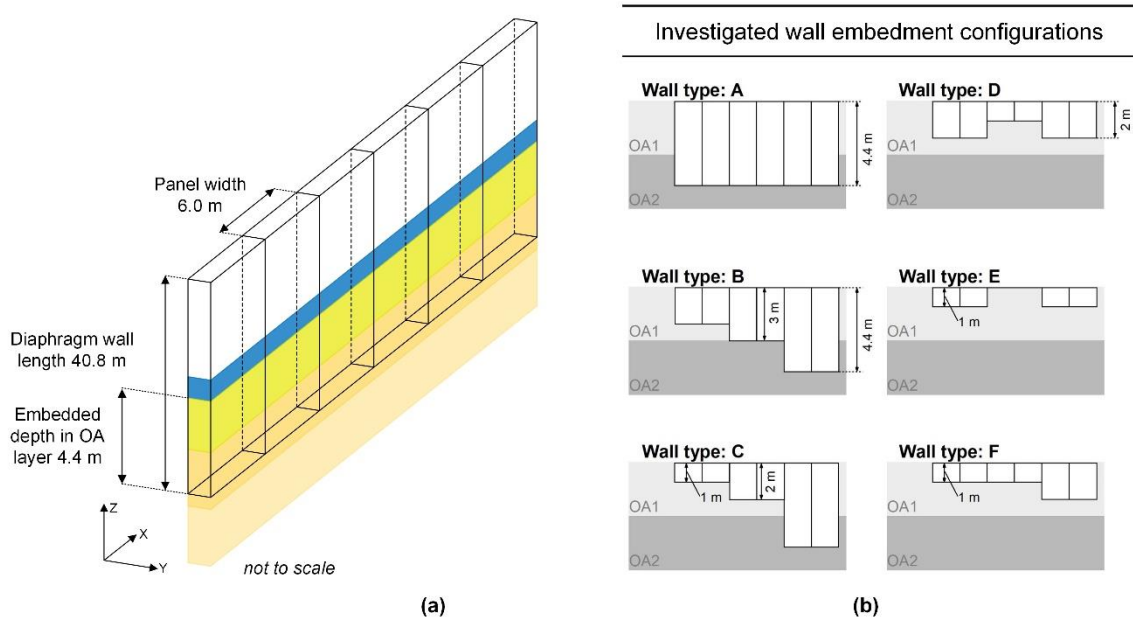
(a) Schematic view of wall geometry and (b) wall configurations with different embedded levels
